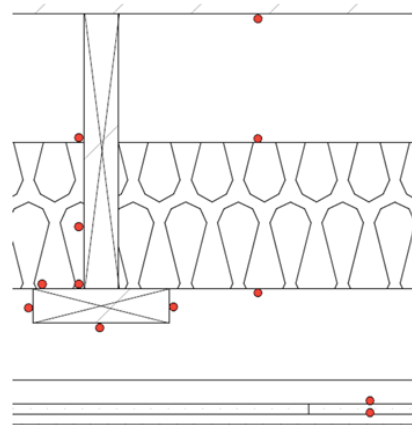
Floor construction, cross-section (top) and longitudinal section (bottom). Measurements in metre (m) (Ill.: Støren Treindustri AS)
